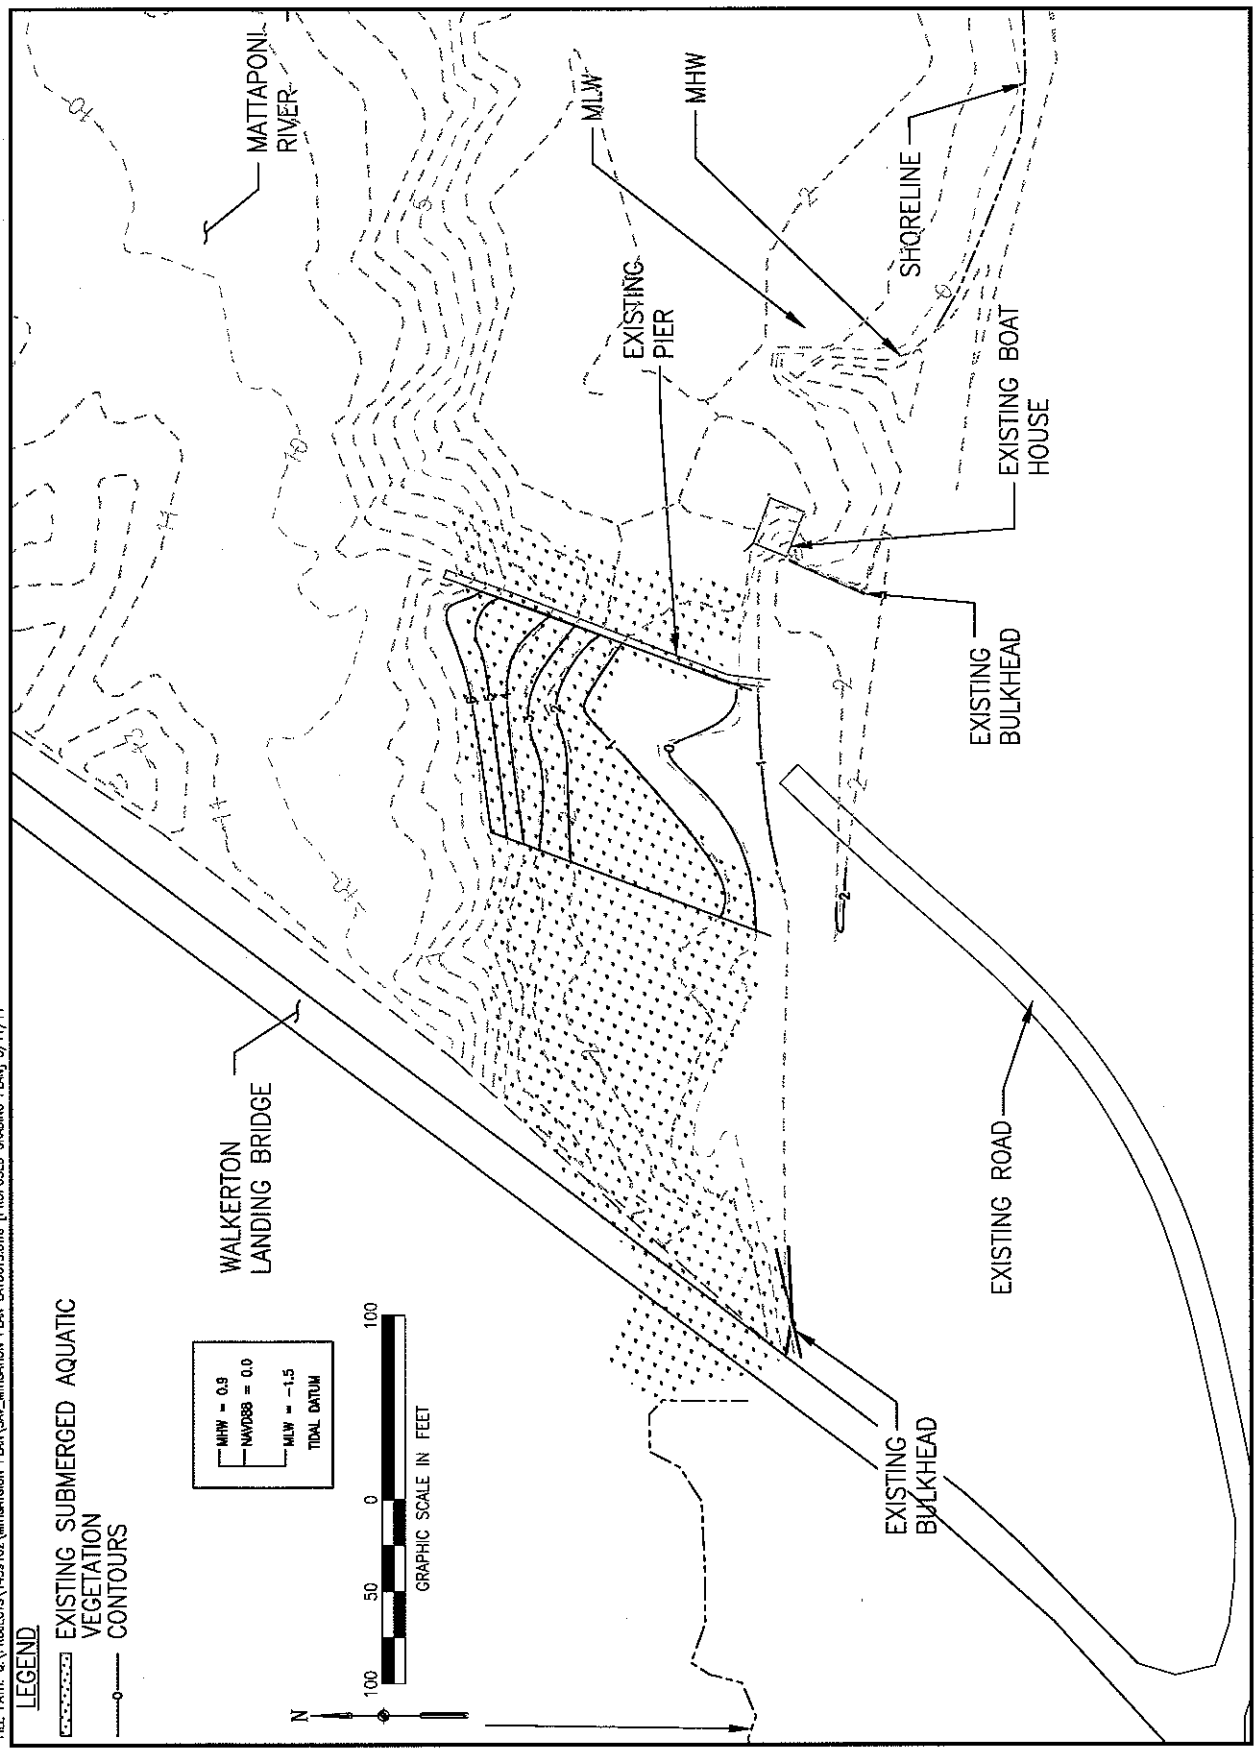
PROPOSED GRADING PLAN FOR SUBMERGED AQUATIC VEGETATION (SAV) RESTORATION PLAN, LARGE COMPONENT TRANSPORT ROUTE ROLL-OFF FACILITY
